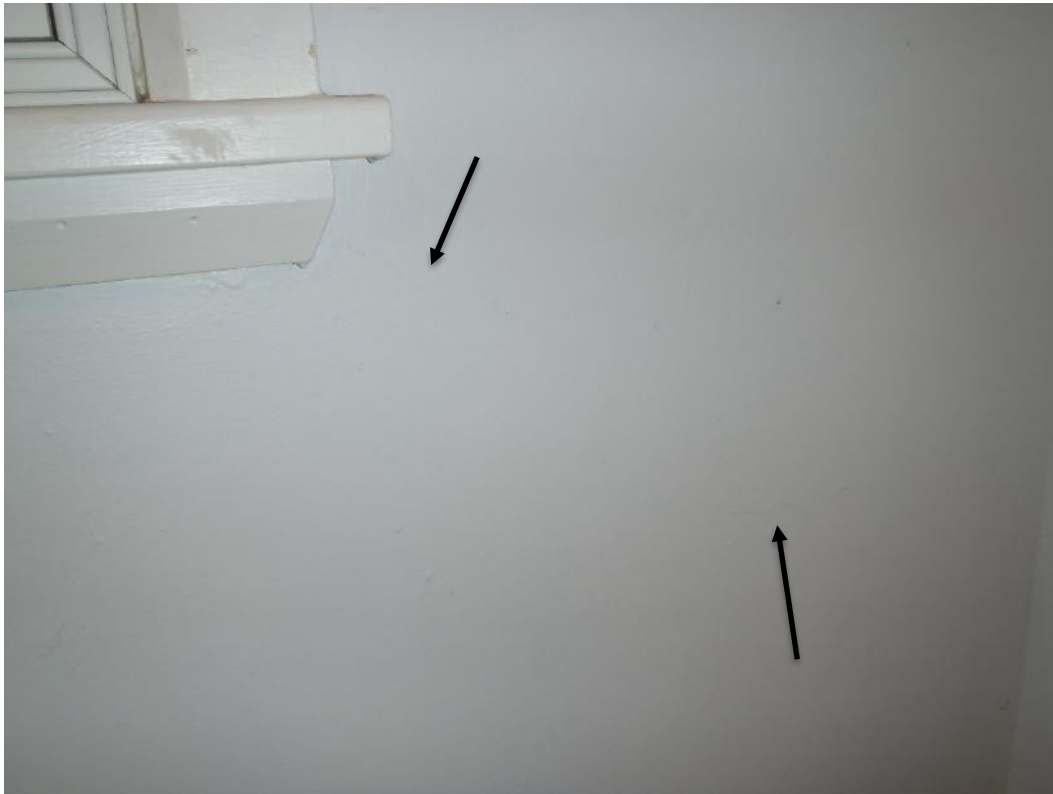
shows separation cracking between the wall surfaces in the south-western corner and evidence of a previous repair to the wall common with Bedroom 1 in the Sunroom.
